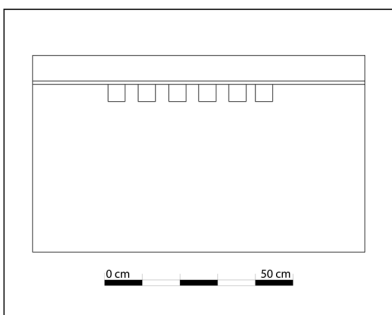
c: The section and view drawings of the architrave block of outer facade
